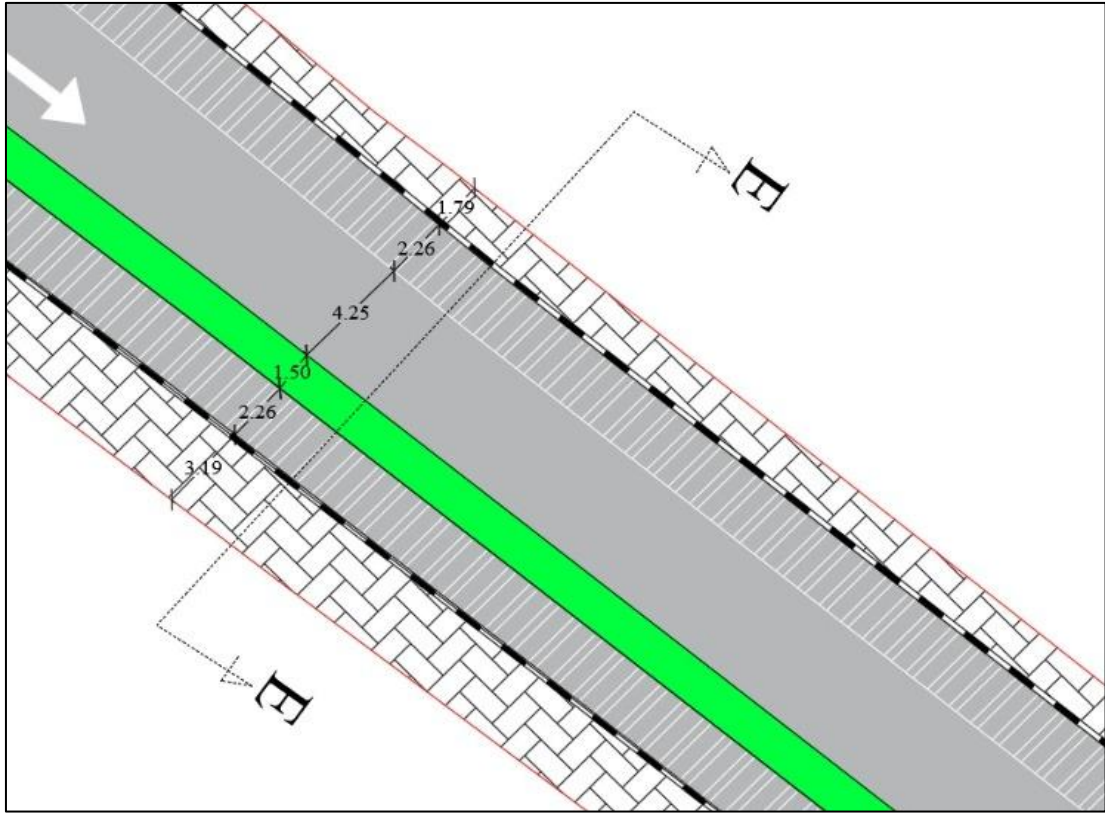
14: Plan Drawing, Section E-E Al-Shwetreh Street
